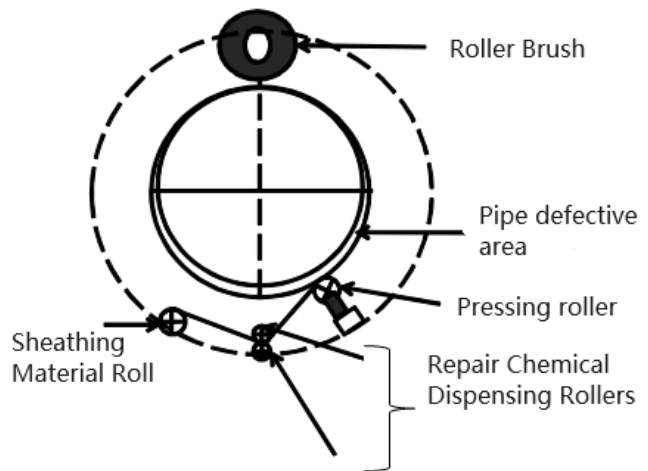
illustrates a cross sectional view of the apparatus while wrapping the sheathing material on a lower half surface of the pipe
